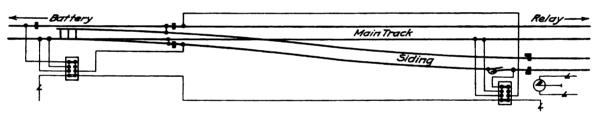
Protection for Switch and Siding Derail; Siding Rail in Series.
